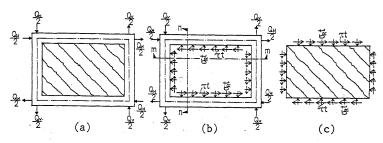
Resistance-Failure Mechanism of Reinforced Concrete Quake-Resisting Wall after Occurrence of Cracks
